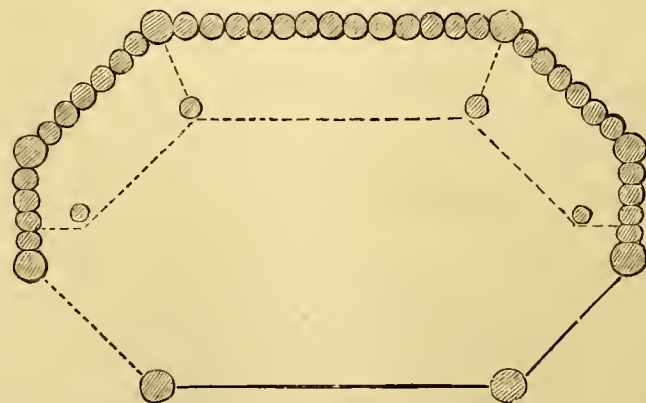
GROUND PLAN OF MEDIUM SUMMER-HOUSE.
